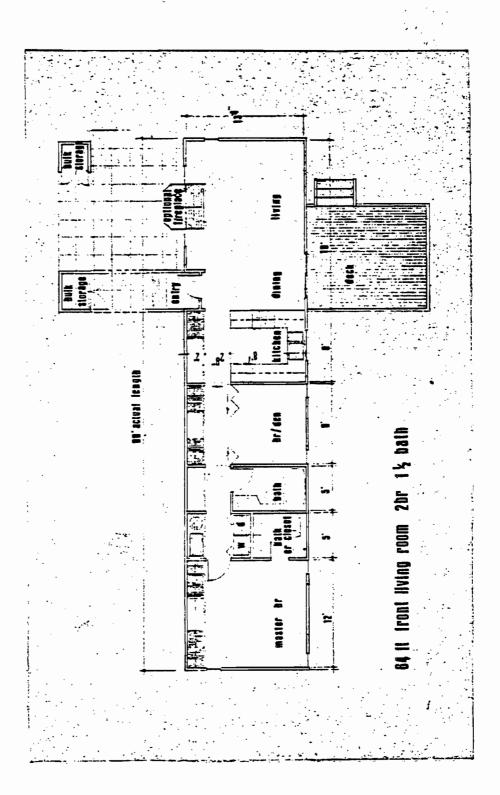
UNIT DESIGN: SITE PLANNING AS A DETERMINANT
